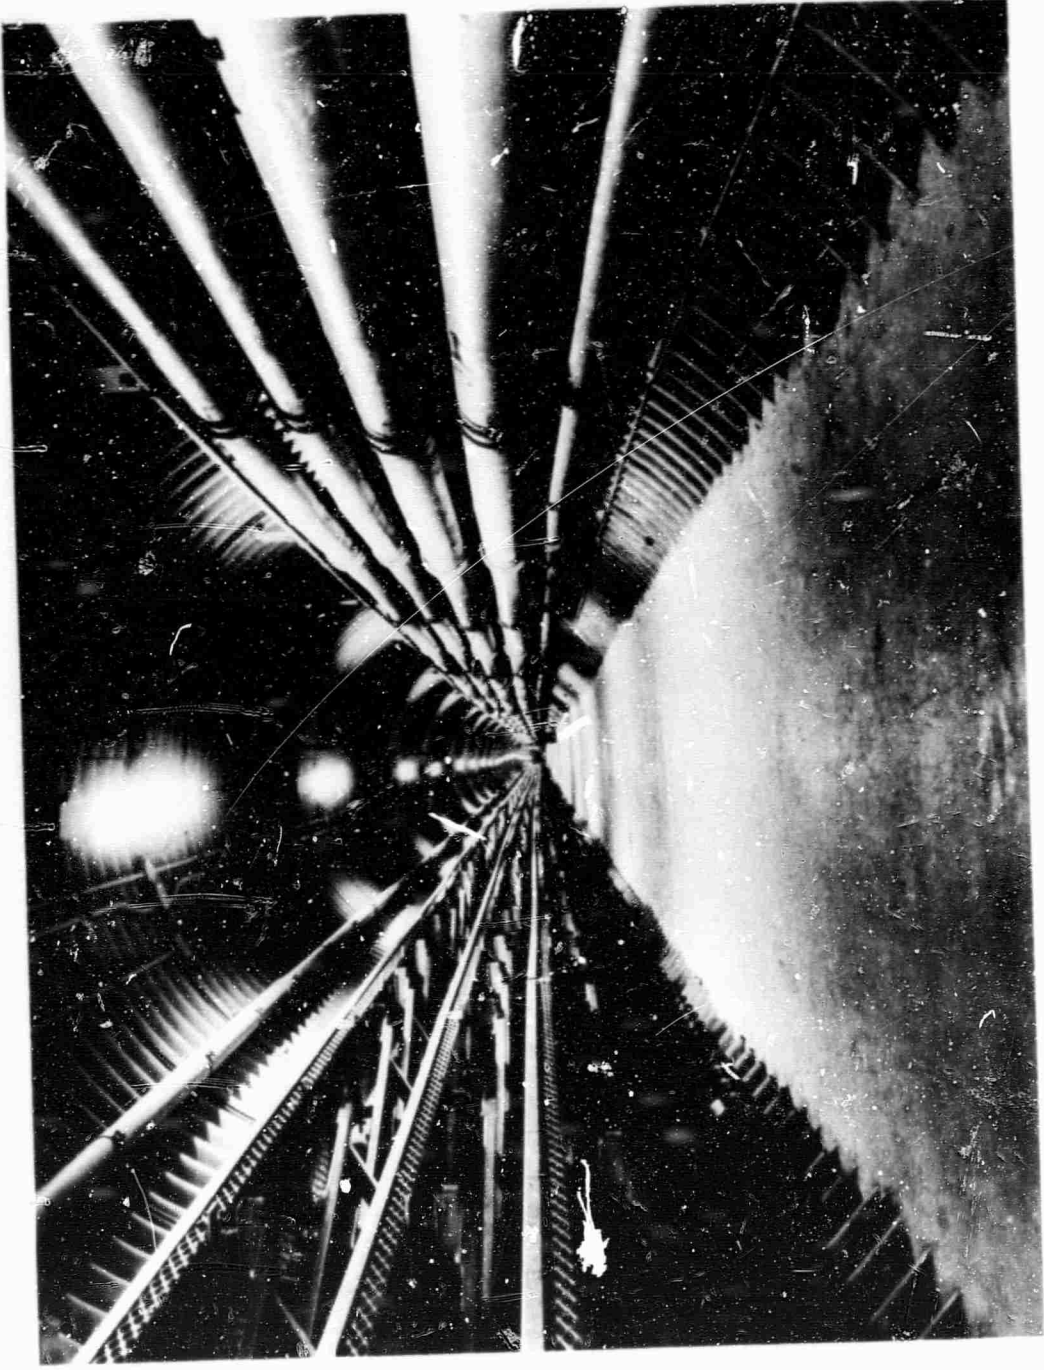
Interior of a multiplate steel tunnel at a Titan I base
